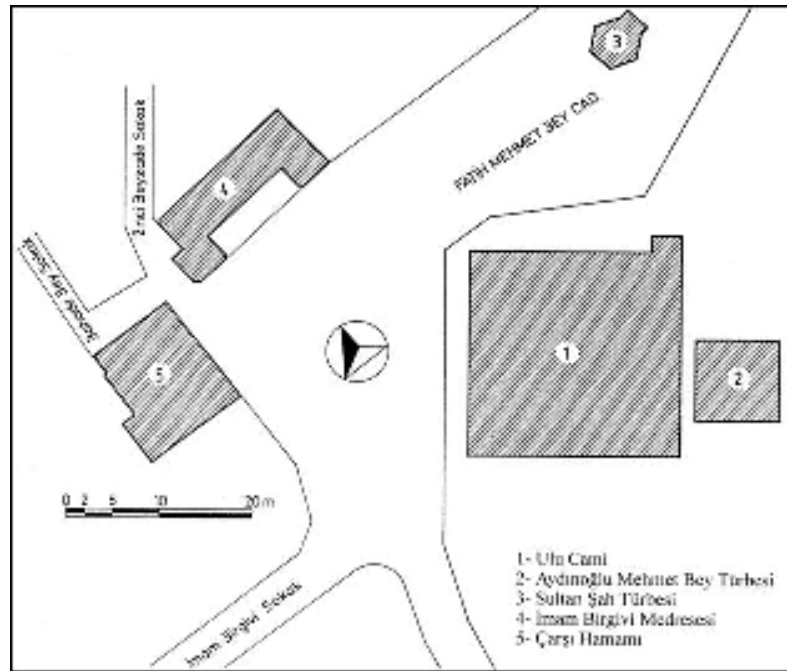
46 Site Plan of Birgi Great Mosque and Surrounding Buildings
